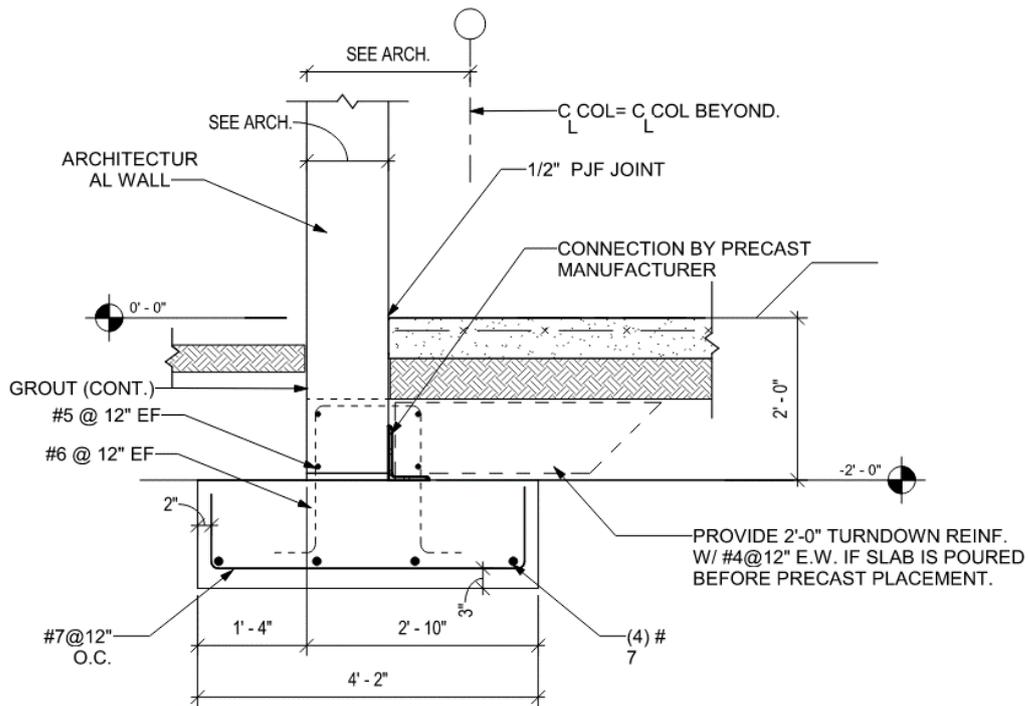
Precast Wall Support Detail – 95% Design Drawings
